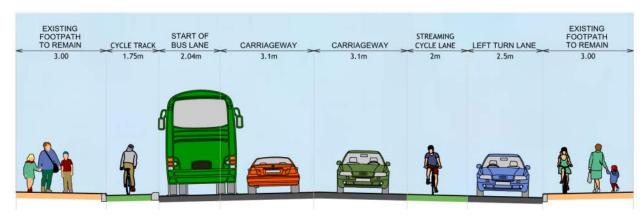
Section 1 Option B Cross Section Ballinacurra Rd - Standard Cycle Tracks on both sides at Pinch Point with Left Turn Lane into Crescent remaining - section not used
